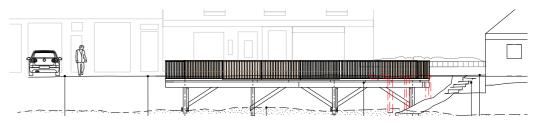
View of proposal from North of harbour wall @ John Renshaw Architects
